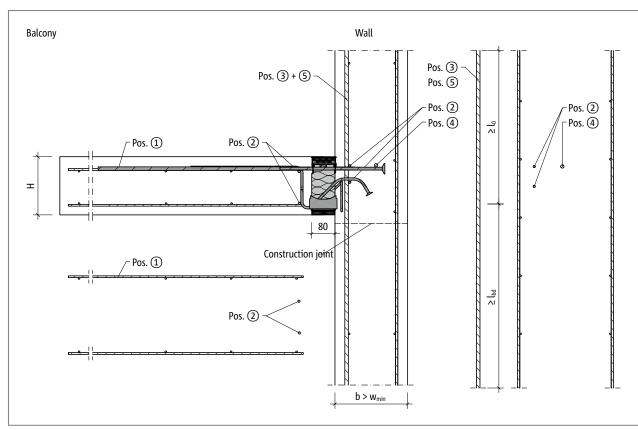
Schöck Isokorb® T type K-U: On-site reinforcement for wall connection upwards with larger structural element dimension (w_{exist}= w_{min})
